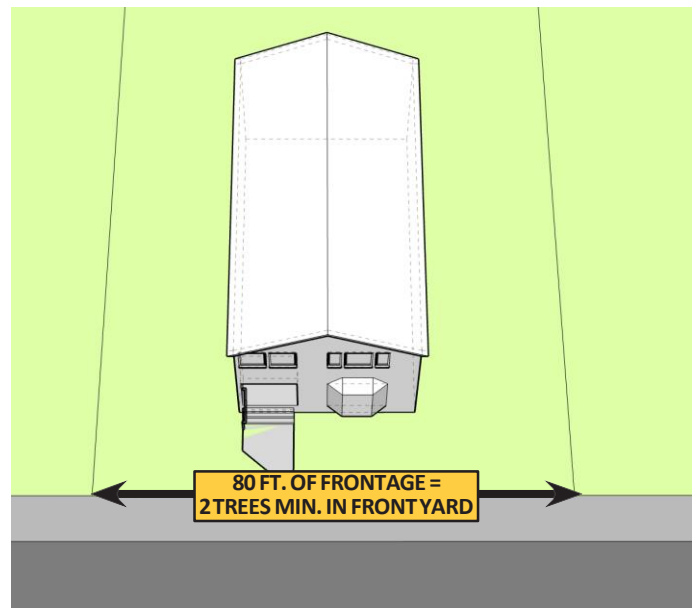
Front yard tree planting is required. One tree shall be planted per 40 linear feet of lot frontage. The illustrated lot has an 80- foot frontage and requires at least 2 street trees to be planted.
